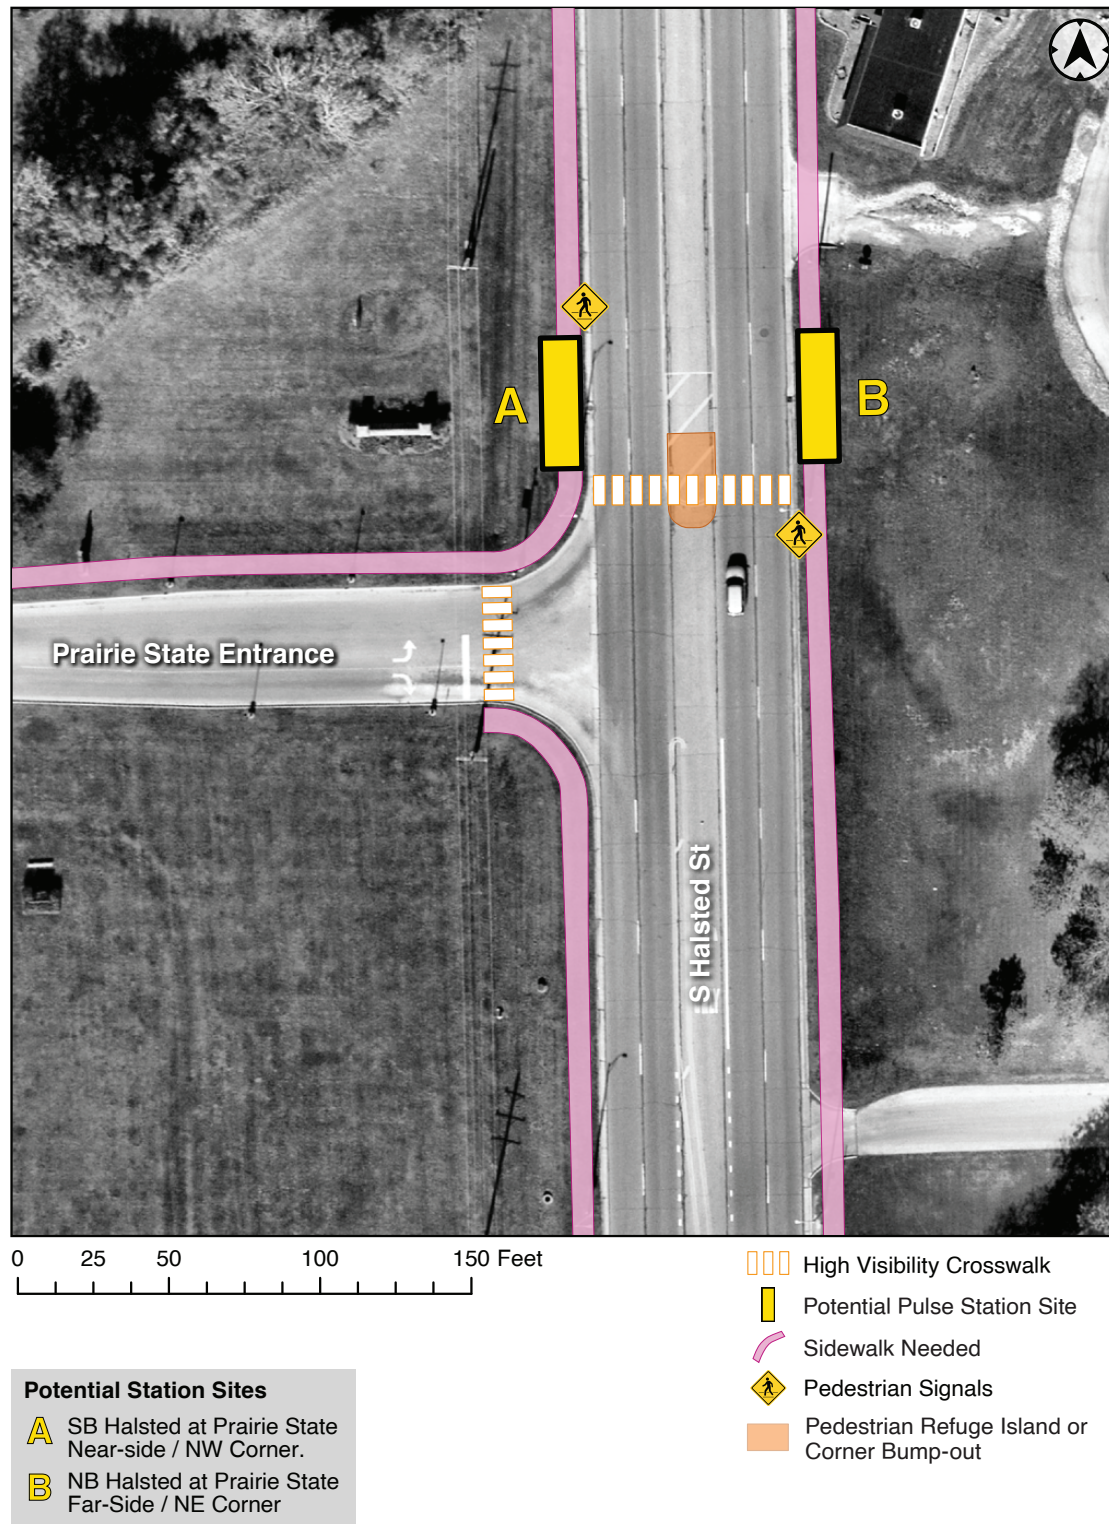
South Halsted Street and Prairie State College Station Area Entrance
